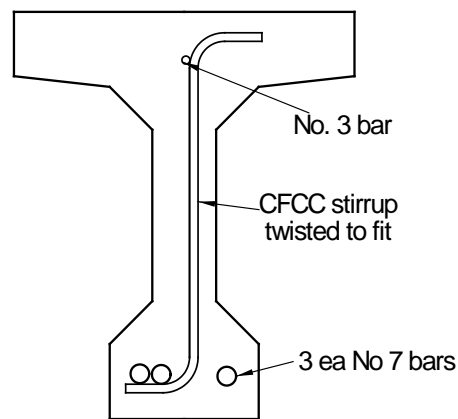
Cross-Section of Specimen 3 with Minimum CFCC Reinforcement
